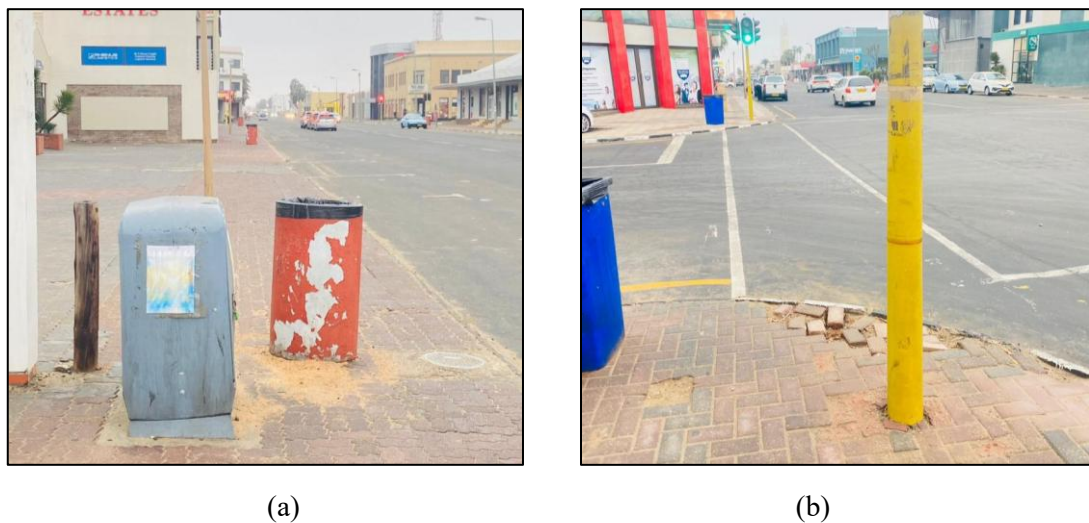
(a) Obstructions on sidewalk; (b) Poles installed after crosswalk
